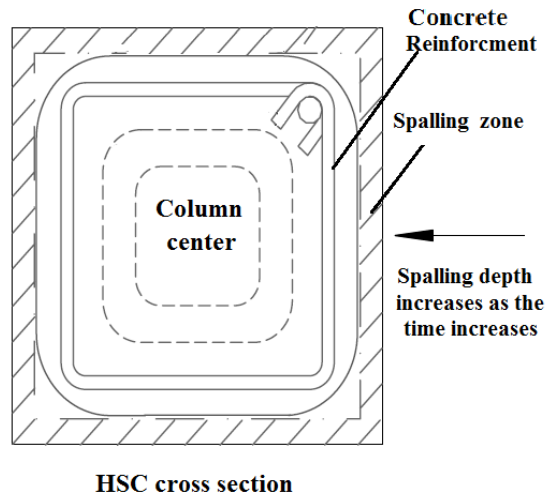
(b) spalling zone and spalling depth increase direction.
